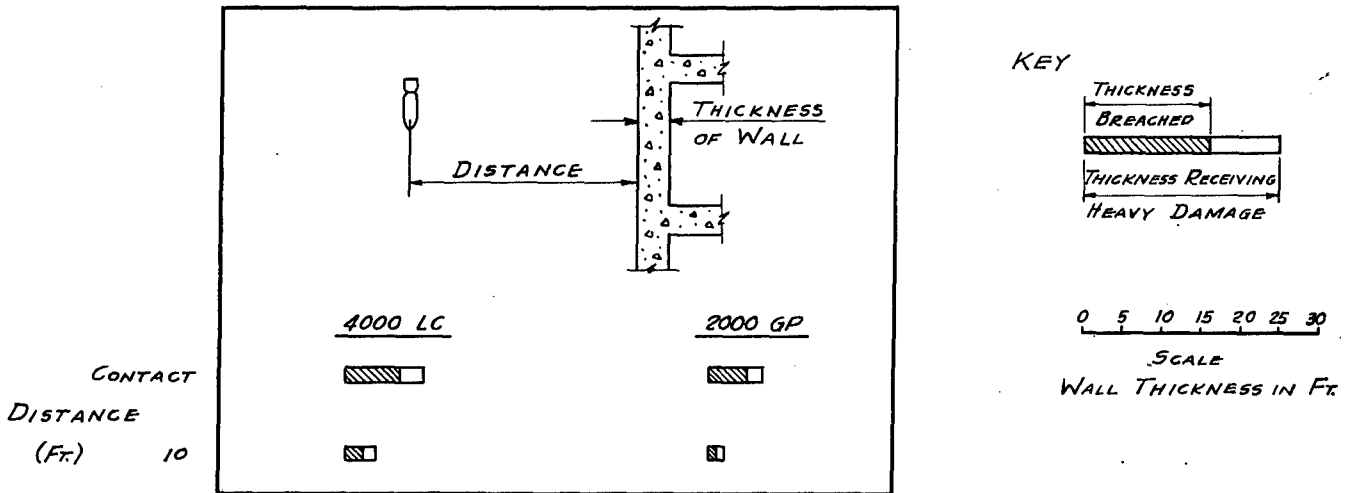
Damage to Reinforced Concrete Walls from Detonation of Bombs Underground or in Air
